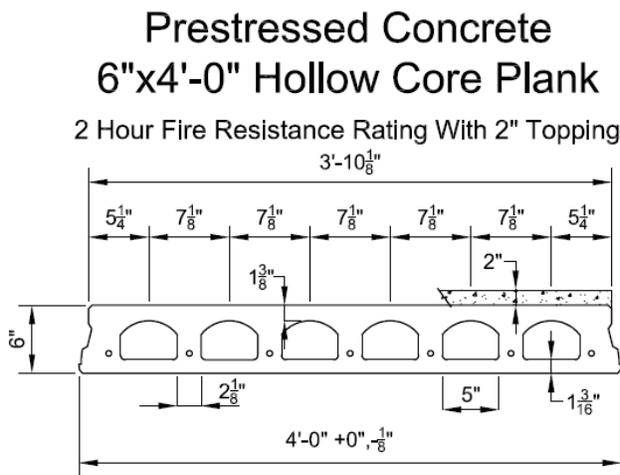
5: Image courtesy of Nitterhouse Concrete Products
